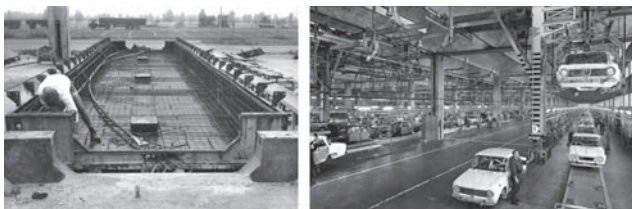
Formwork and reinforcement of an half of the box beam and an internal view of the building
